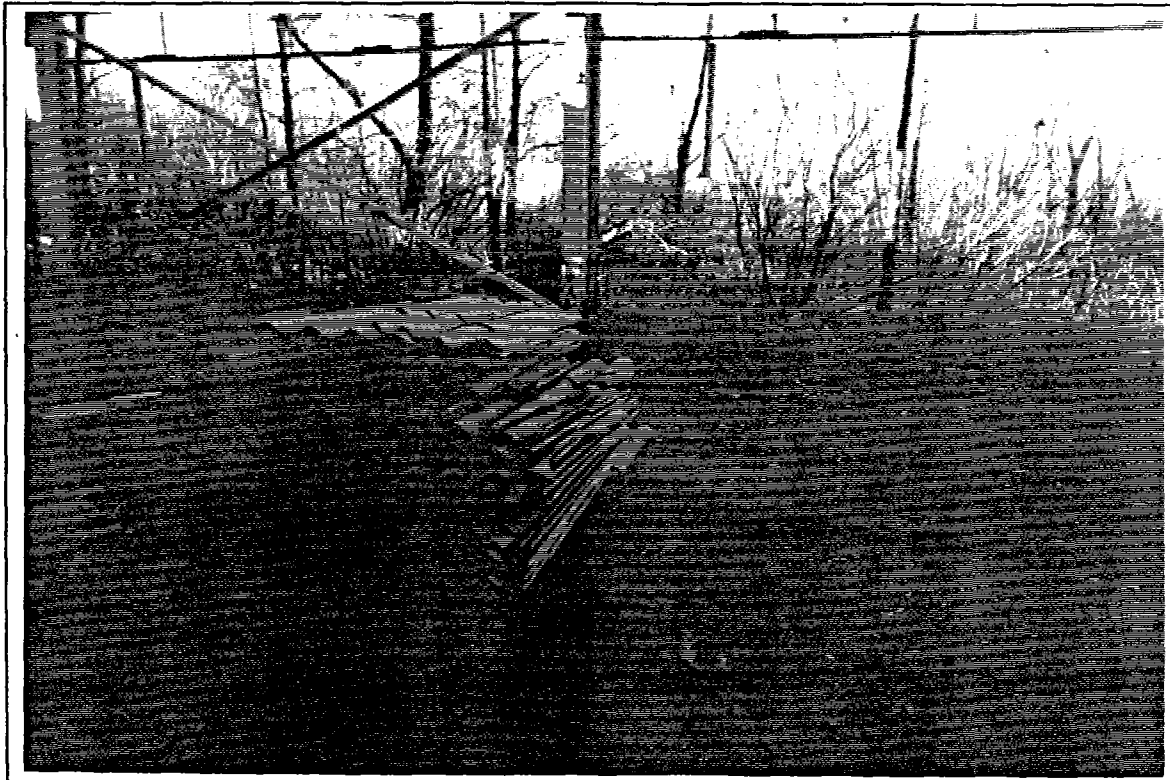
Building 6-01 - West wing. Typical accumulation of corrugated asbestos transite siding removed from walls of Building 6-01 (Sample No. 1-008).
